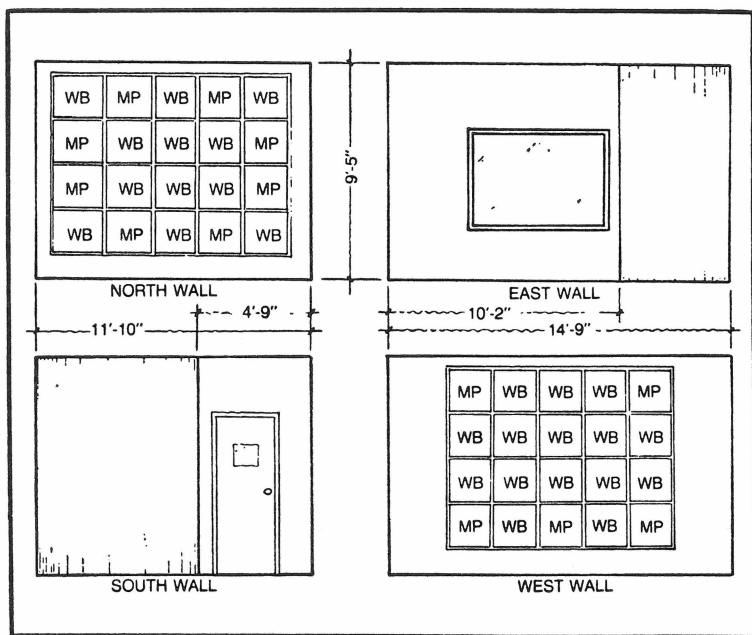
Wall elevations of speech studio showing placement of wideband (WB) and mid peak (MP) absorber modules.
